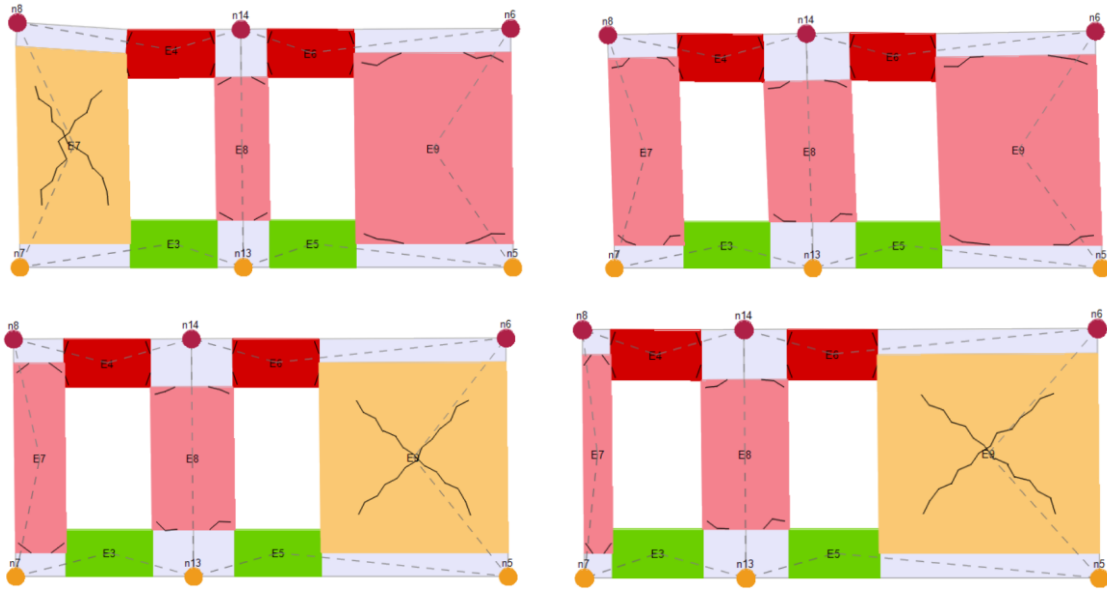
Failure patterns 3MURI Wall 9 (upper-left), Wall 10 (upper-right), Wall 11 (lower-left) and Wall 12 (lower-right)
